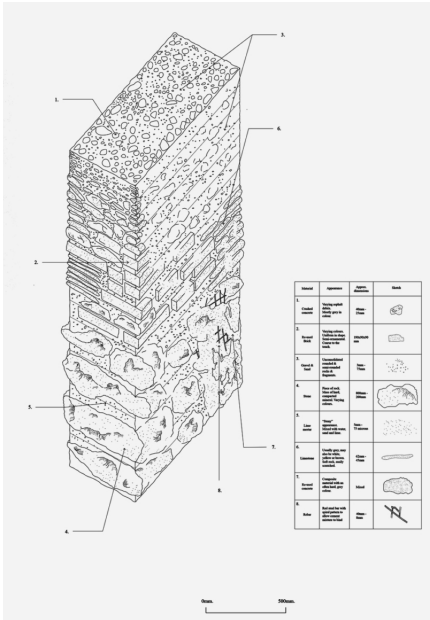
| Demolition waste wall. A possible building solution to large piles of debris. (Robert Luke Johnstone, n.d.)
